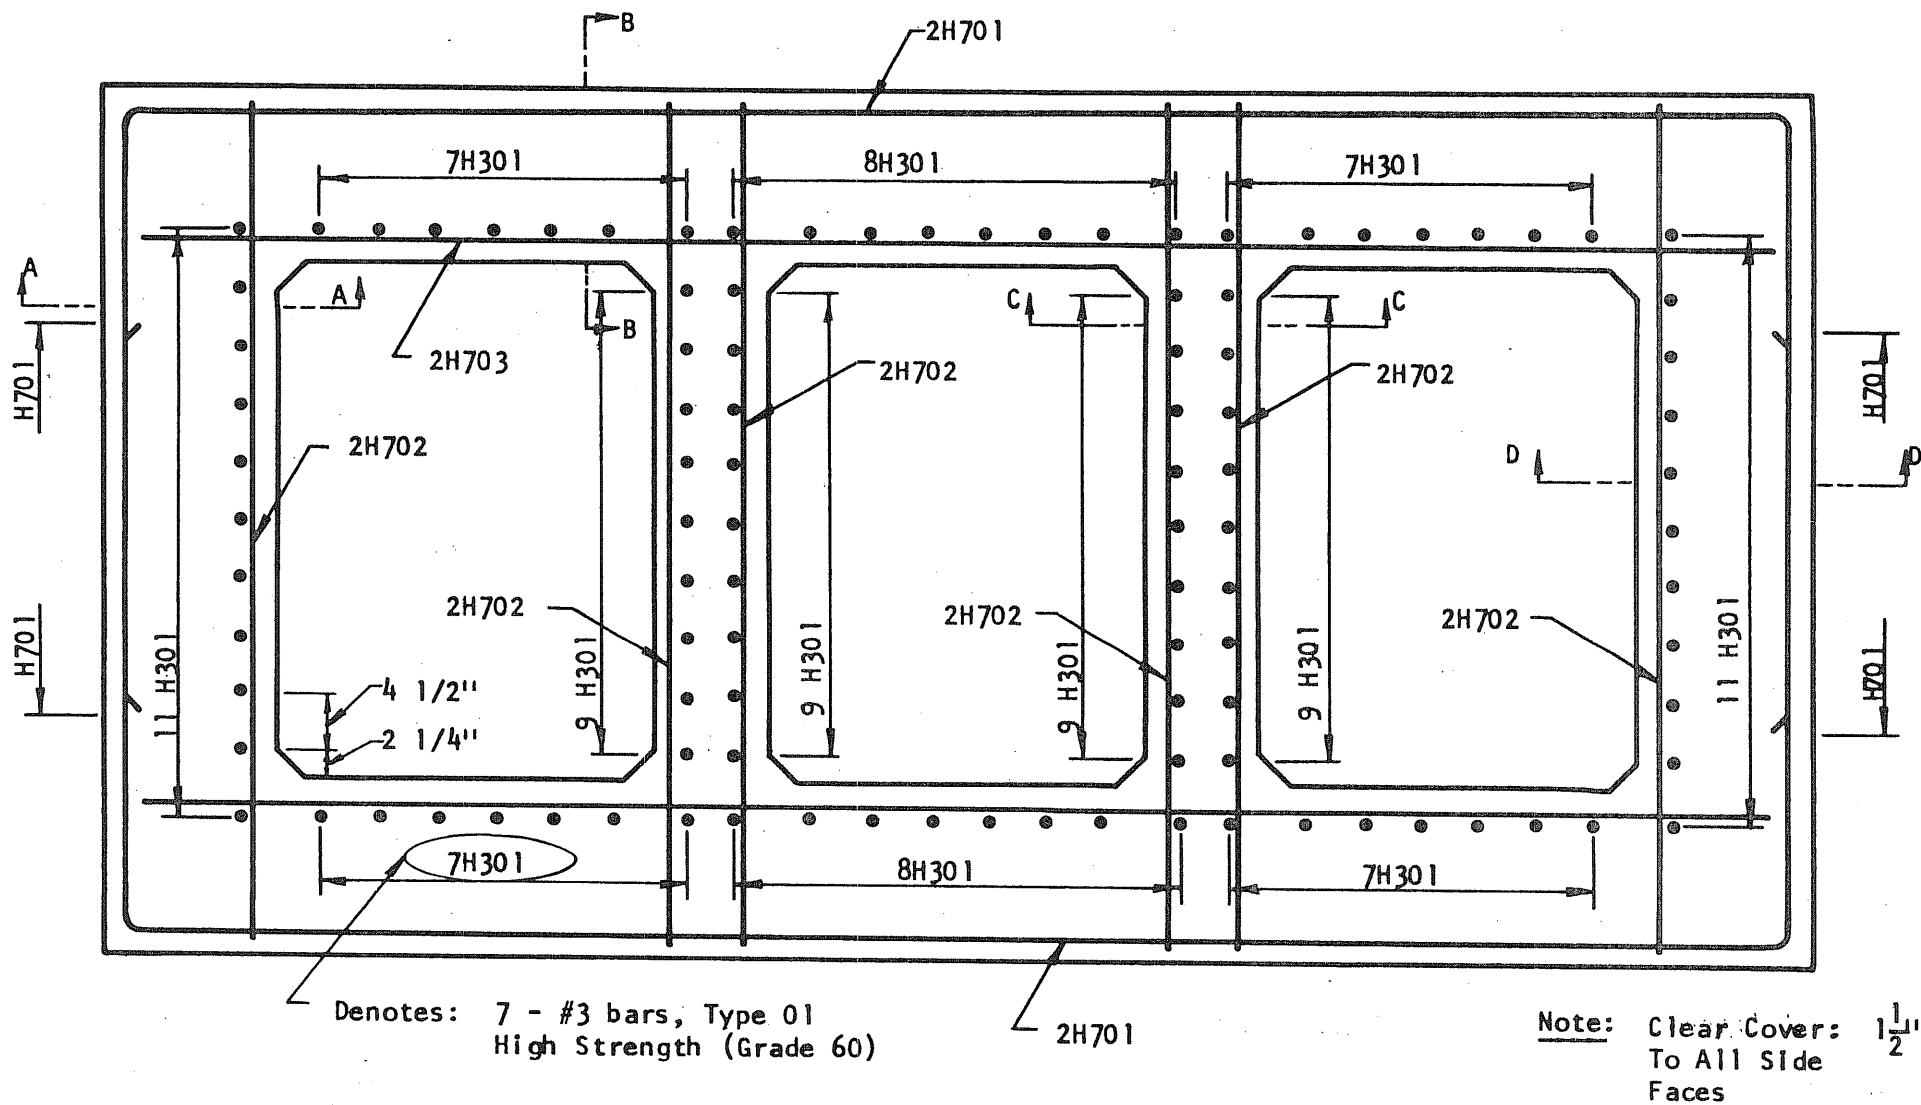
ARRANGEMENT OF REINFORCEMENT IN SPECIMEN R1
